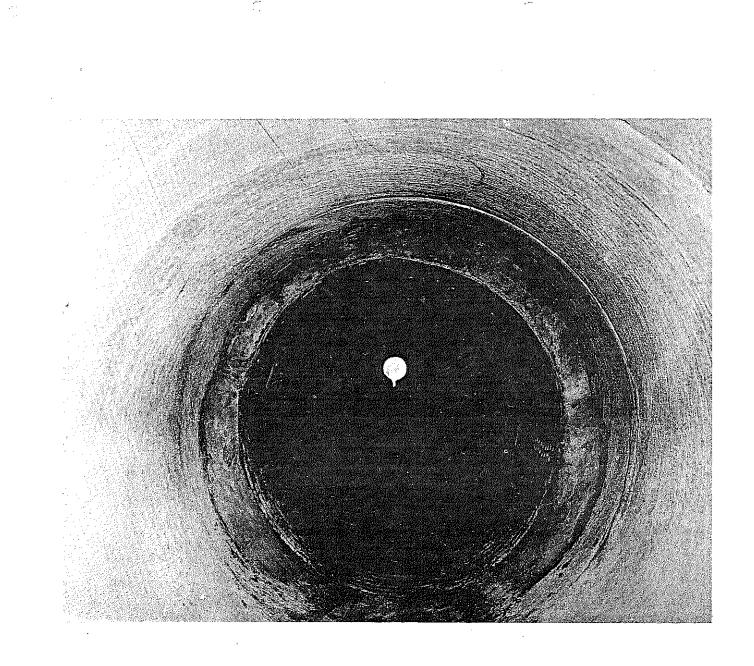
Failure in Bottom of 54-inch Culvert Under a 53-foot Fill, Station 1087 + 50, 175-7(5)160, Grant County
